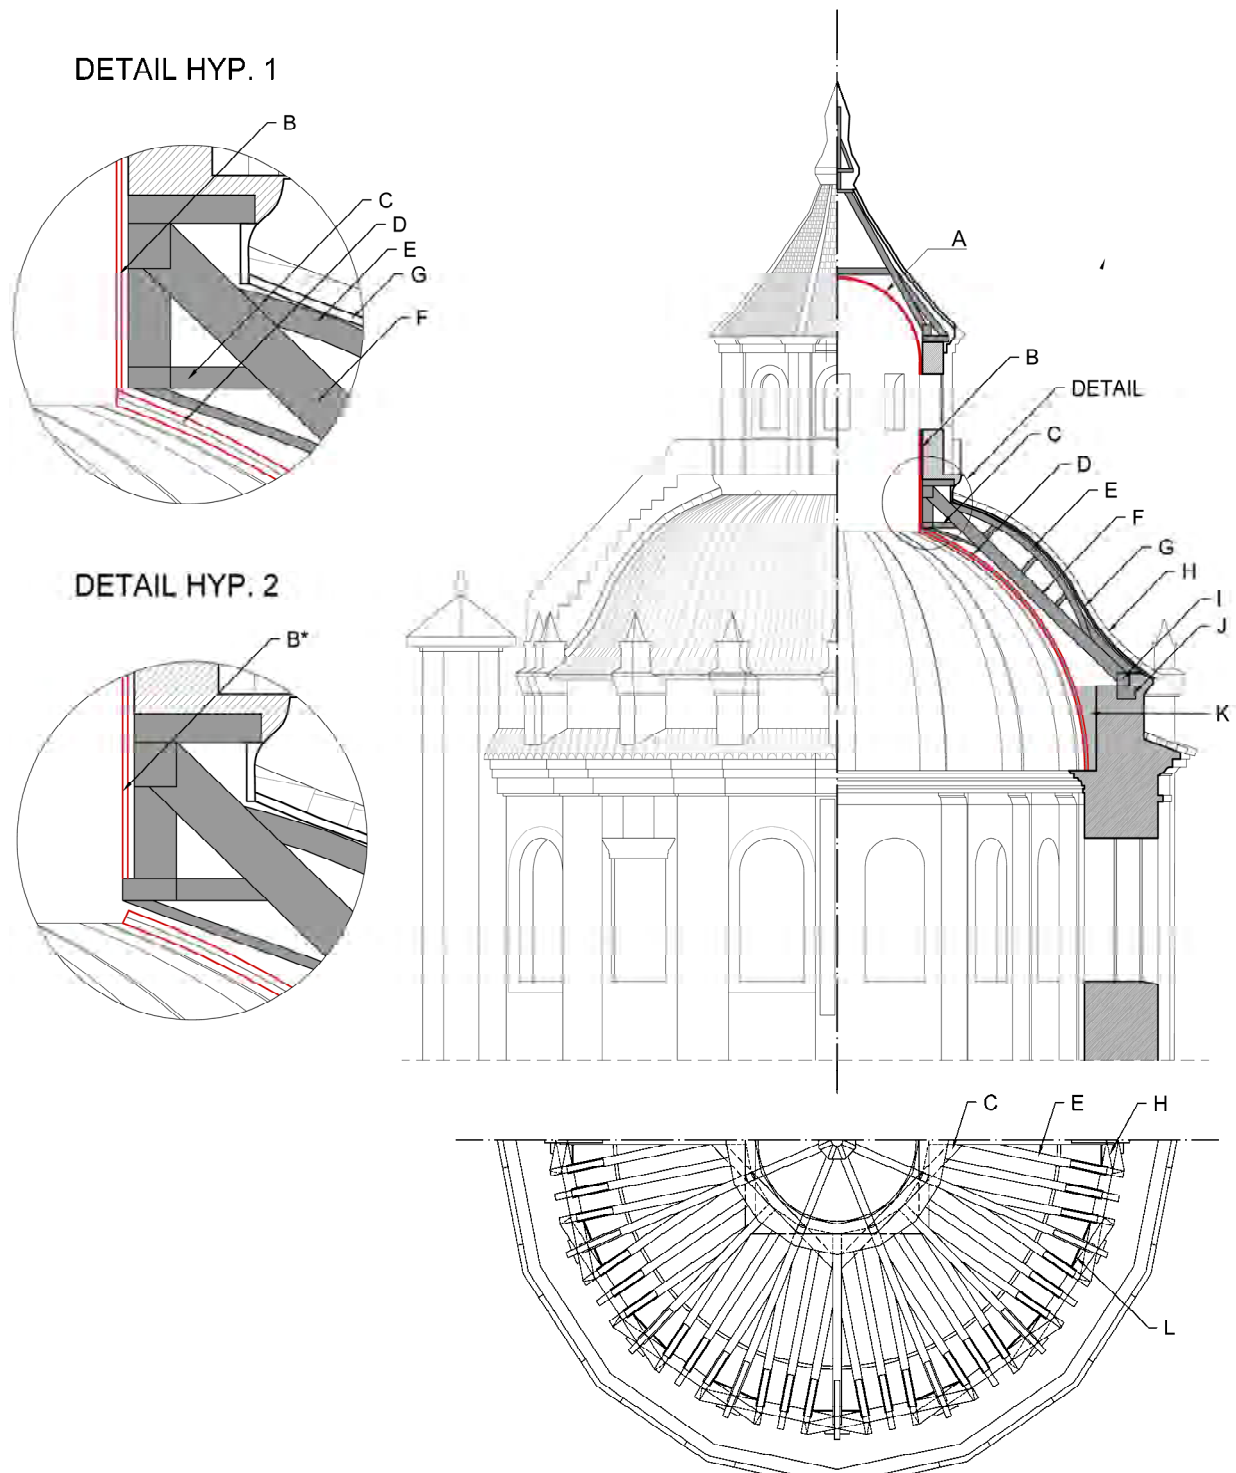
Constructive system, floor plan, section and elevation of the dome, with details A and B for different hypothesis of the lantern support system.
